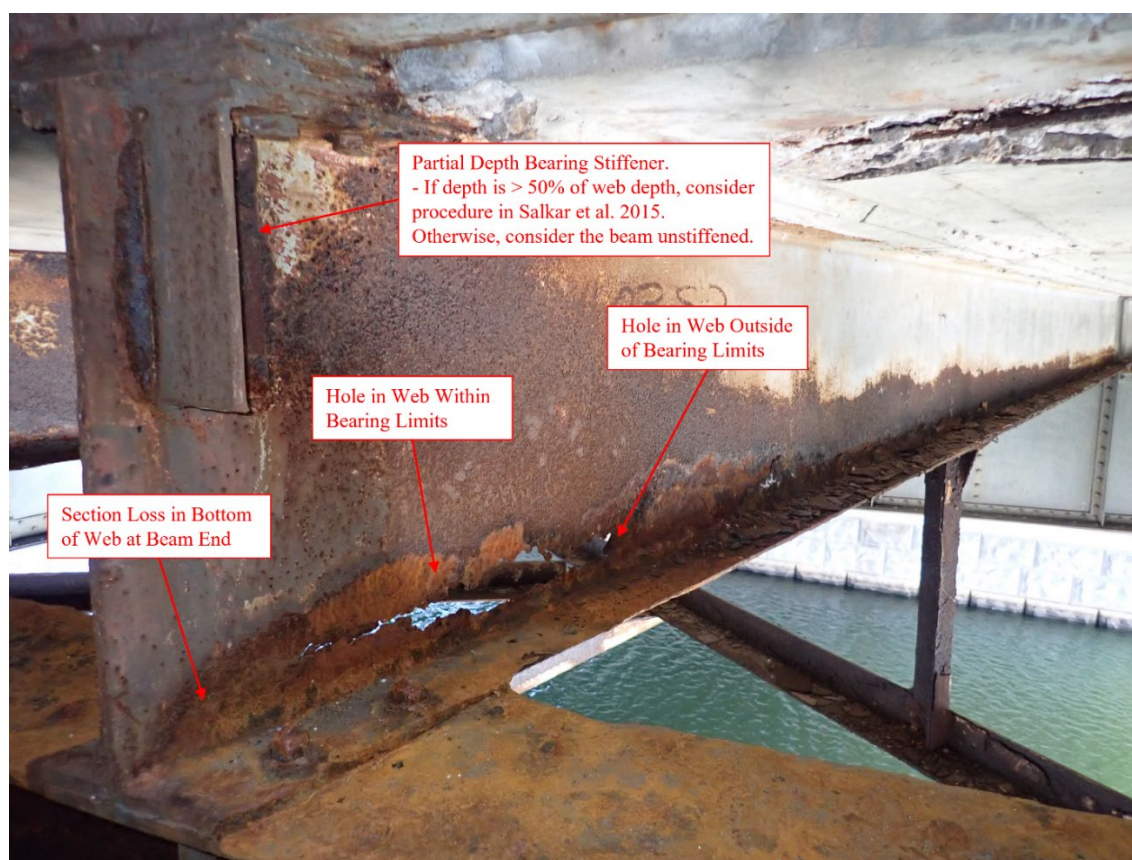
Example of Section Loss in Unstiffened Beam Web at Concentrated Load
